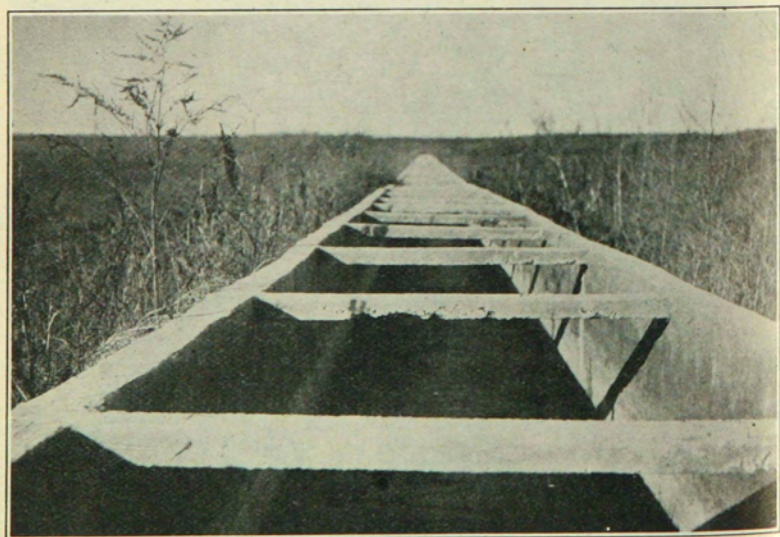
Plate VI. Concrete Flume, Long Pond, Fort Collins.
